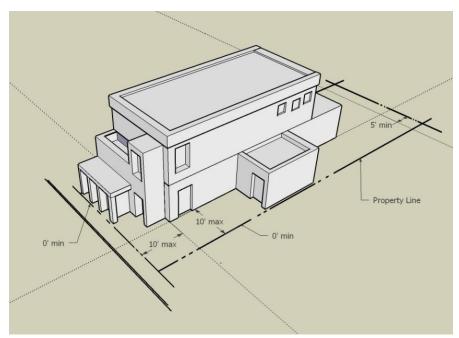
NFTOD BUILDING PLACEMENT
